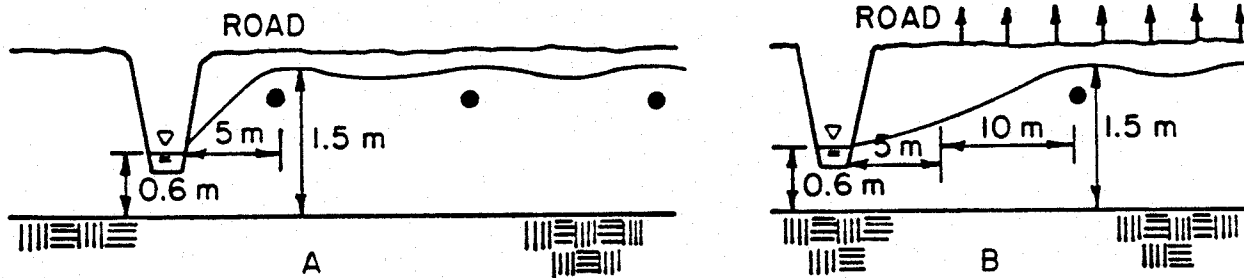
Seepage along Boundary A-B: (a) the first drain tube is located immediately adjacent to the field access road 5 m from the drainage ditch, and (b) the drain tube is located 10 m back from the road.
